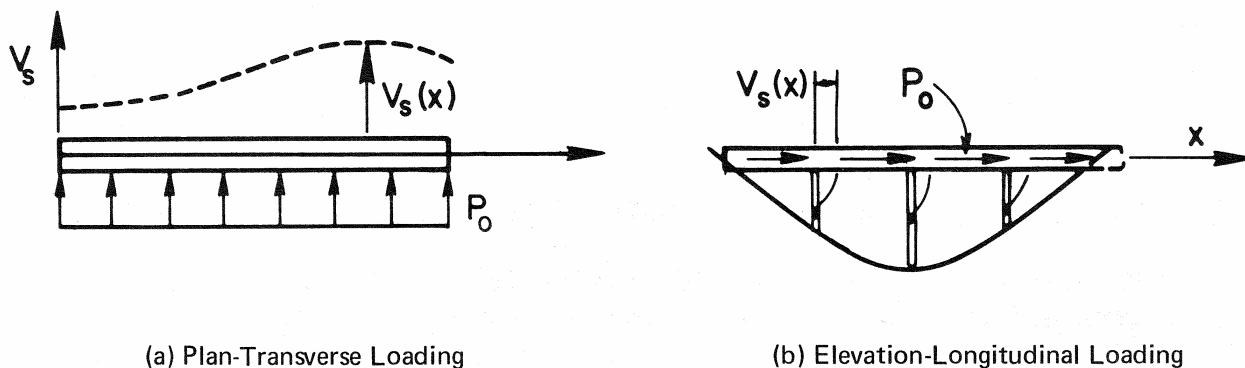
Bridge Deck Subjected to Assumed Transverse and Longitudinal Loading
